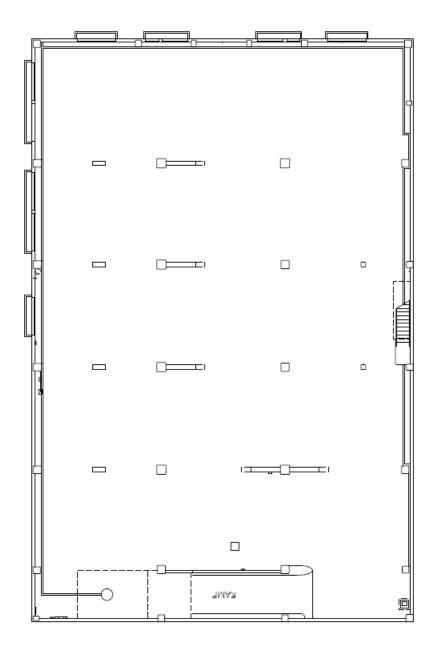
Existing Basement Plan. Courtesy of Open Studio Architecture. N 👚
